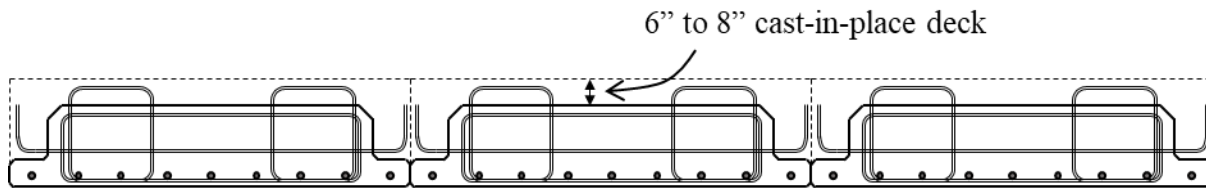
Typical FSB section with 6 to 8-inch CIP composite deck
